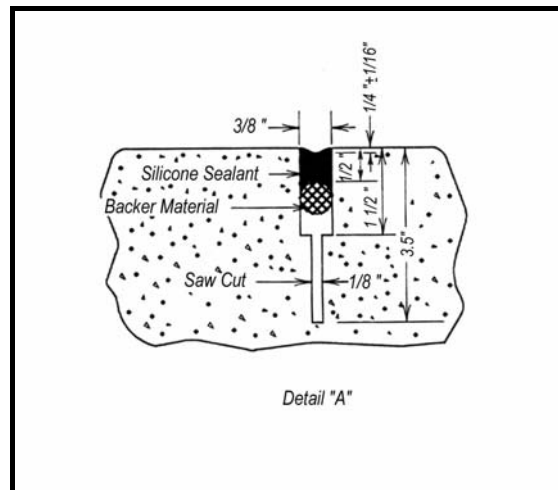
Transverse contraction joint used in LA DOTD jointed plain concrete pavement projects.
